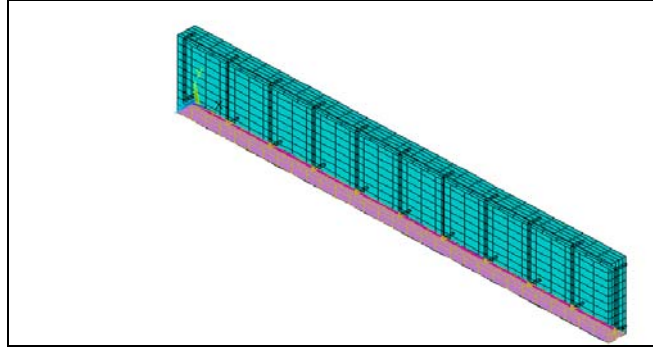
Meshing of concrete, reinforcement, CFRP plate
